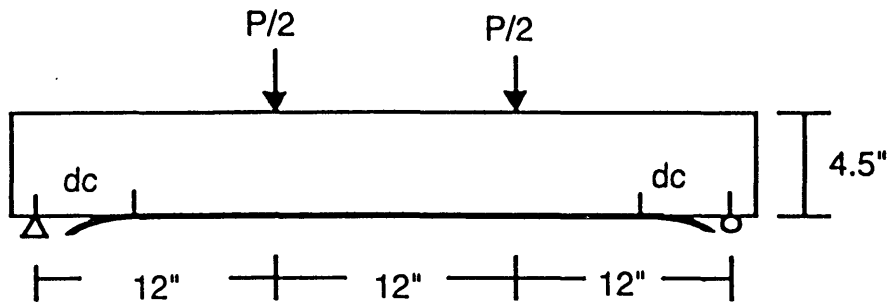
FRP Retrofitted Beam with Initial Delaminations
